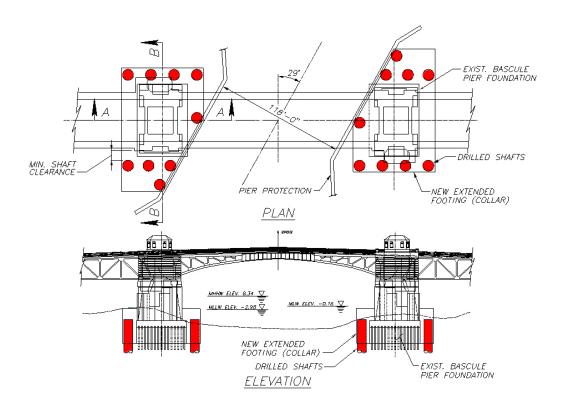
Bascule Pier Foundation – Rehabilitation Option 1 (Plan and Elevation)
